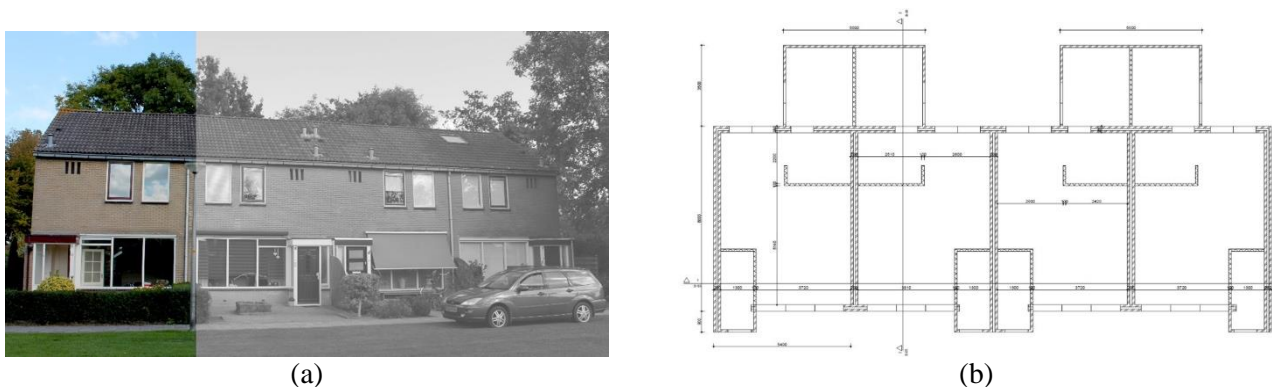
Typical terraced house in Groningen: (a) front façade with end unit highlighted; (b) plan view.
